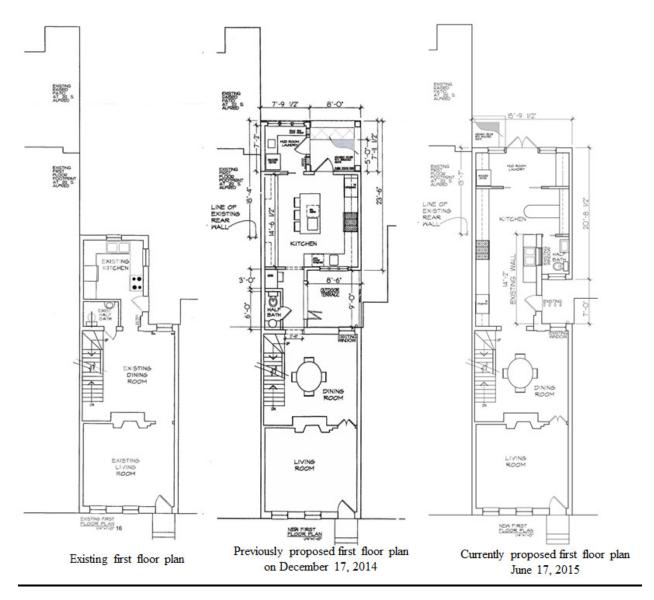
Comparison of the existing, previously deferred, and current first floor plans
